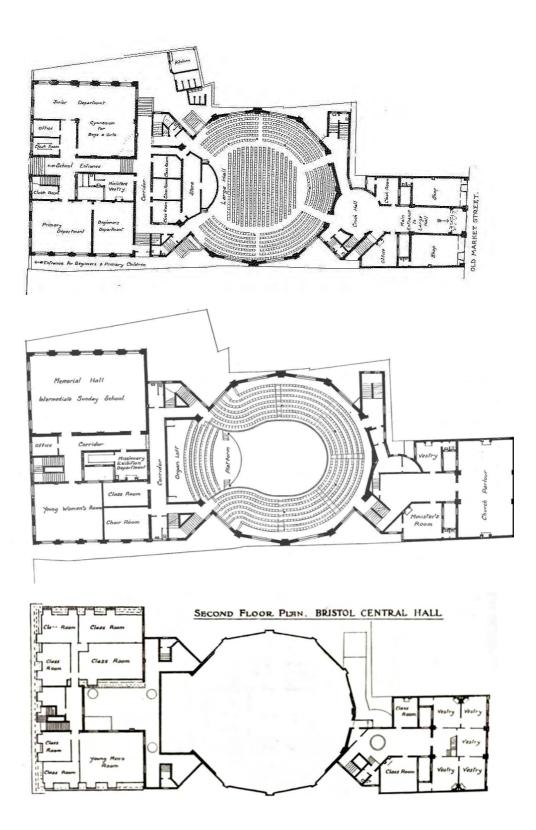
(Top to Bottom) Ground, First and Second Floor Plans of Bristol Central Hall. Source: The Romance of a Modern Methodist Mission 1922 – 1929, The New Room, Bristol.
